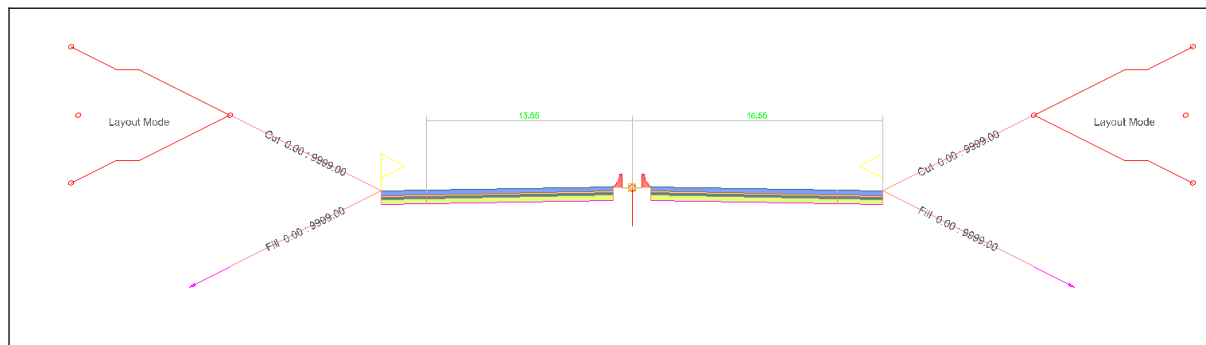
Longitudinal section of horizontal alignment design planning.
